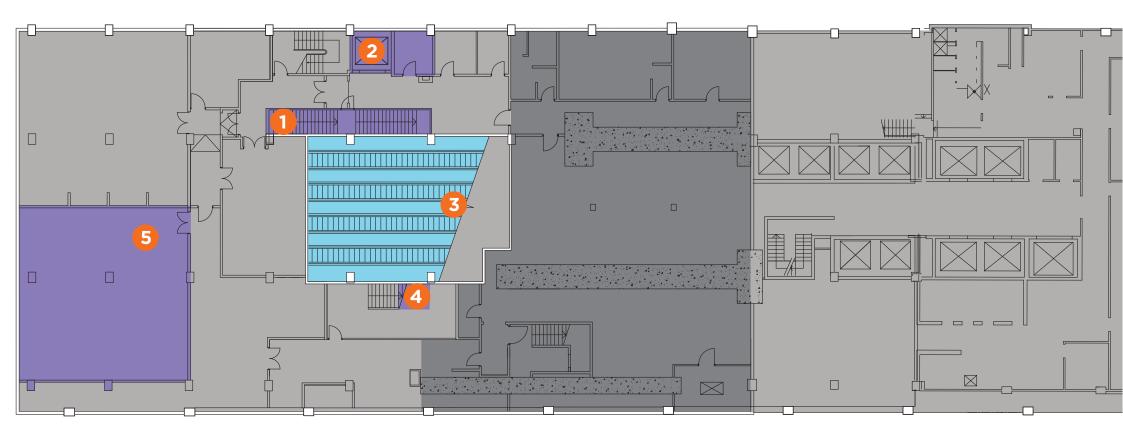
Transport House, basement level 1 layout (indicative) - key heritage works
